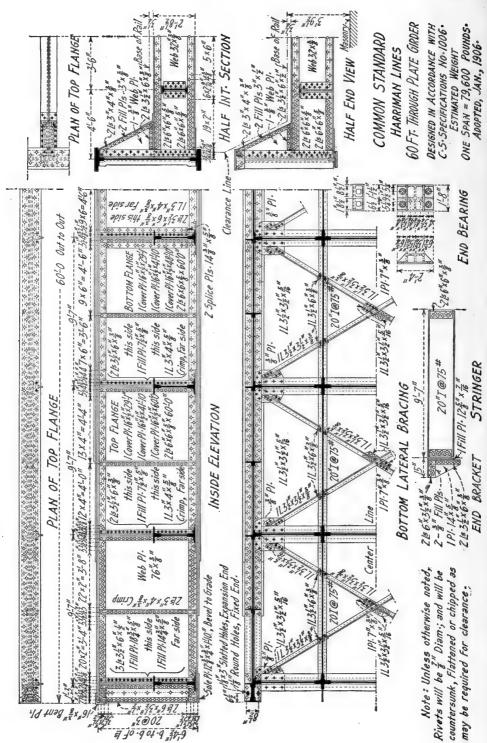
THROUGH PLATE GIRDER BRIDGE.
